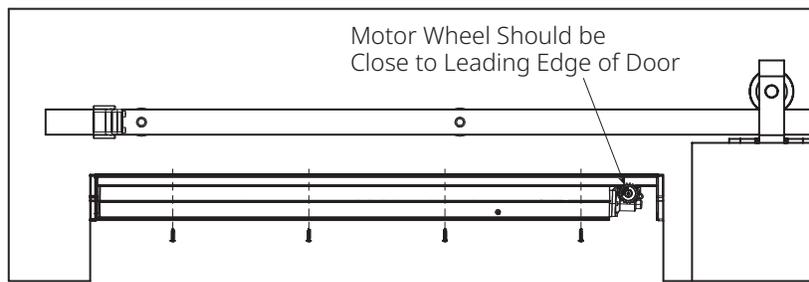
Pocket Sliding Door with Adapter Bracket
